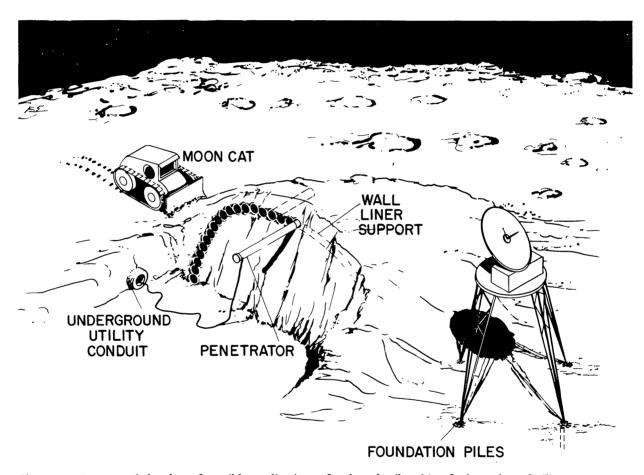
Conceptual sketches of possible applications of rock and soil melting for lunar base facility construction using melted-in-place glass lining.
